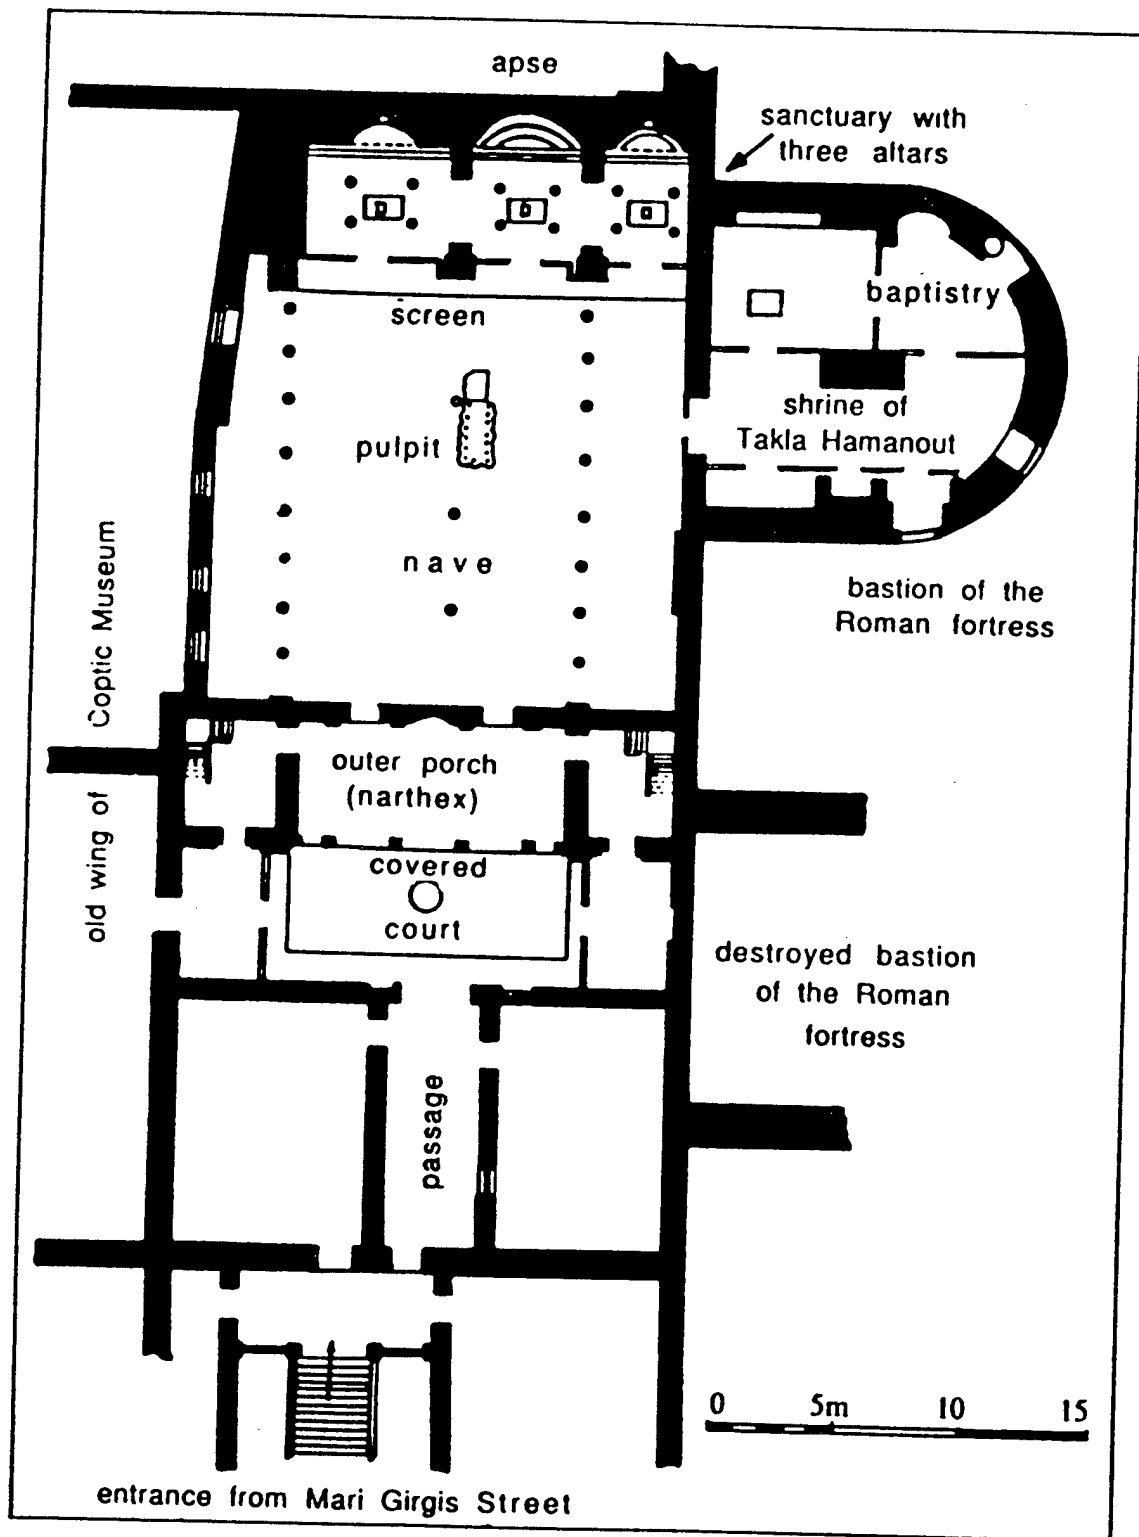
Floor plan of el-Moallaqa Church (Kamil 1990)
